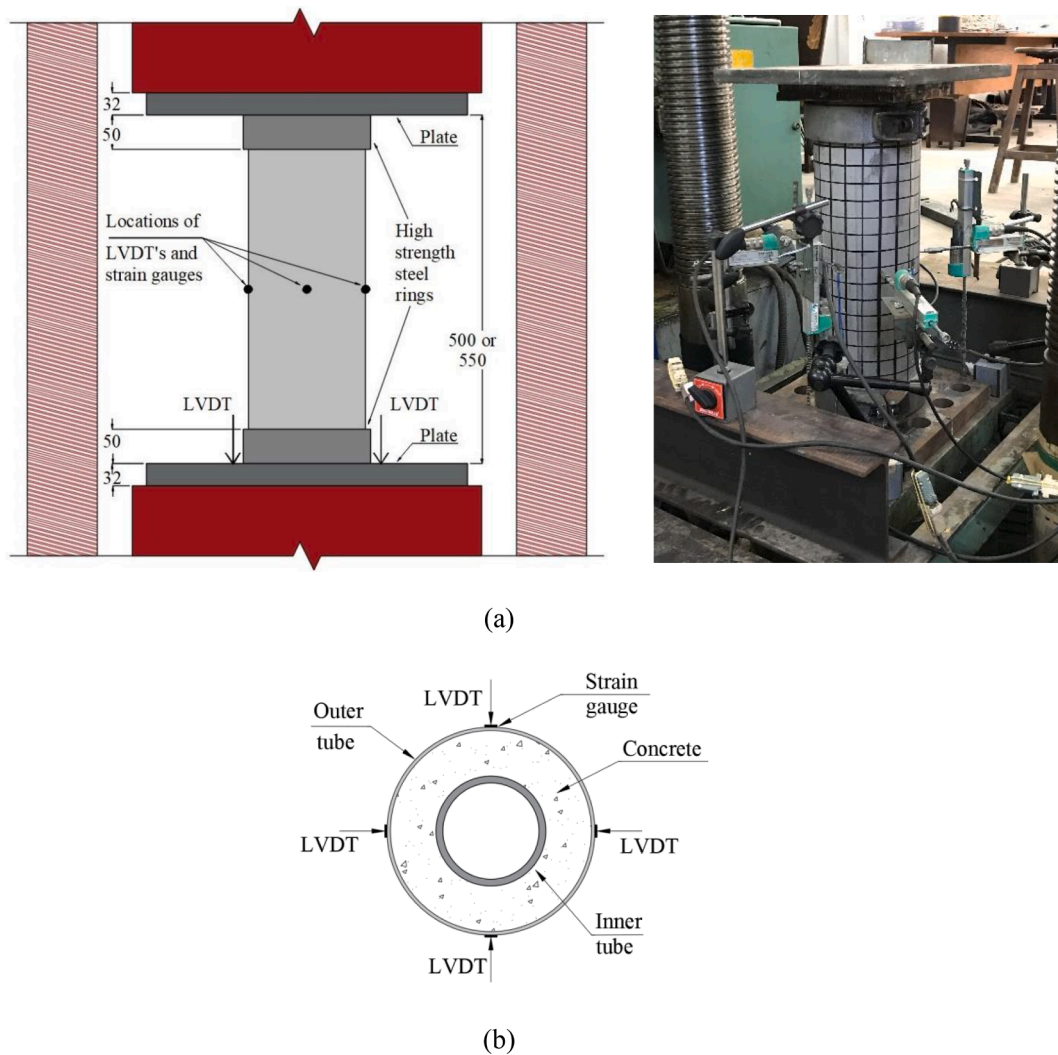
Test arrangement showing (a) a schematic and photographic view in elevation (all dimensions are in mm) and (b) a cross-section view.
